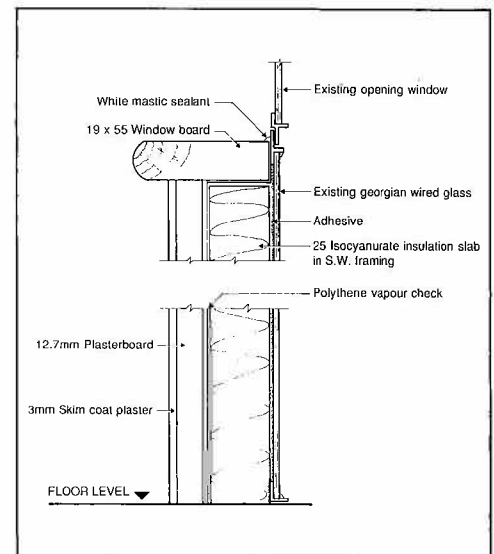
Darwin Building, eighth floor – window infill panel detail
